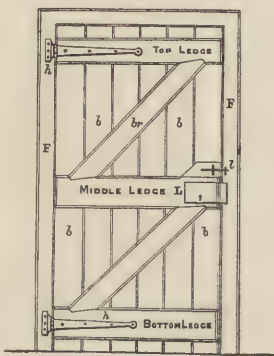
Inside Elevation of Ledged and Braced Door.
